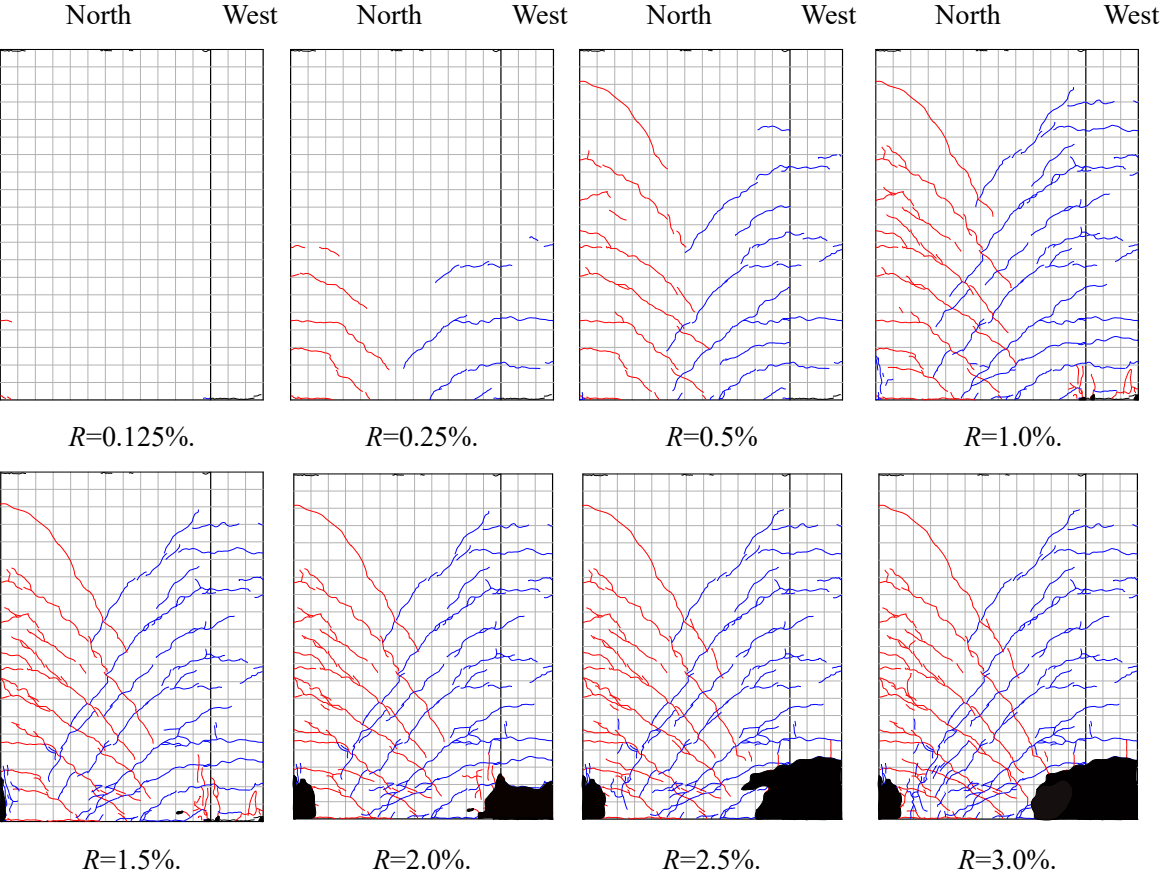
Cracks patterns observed on specimen W20-FU-15
